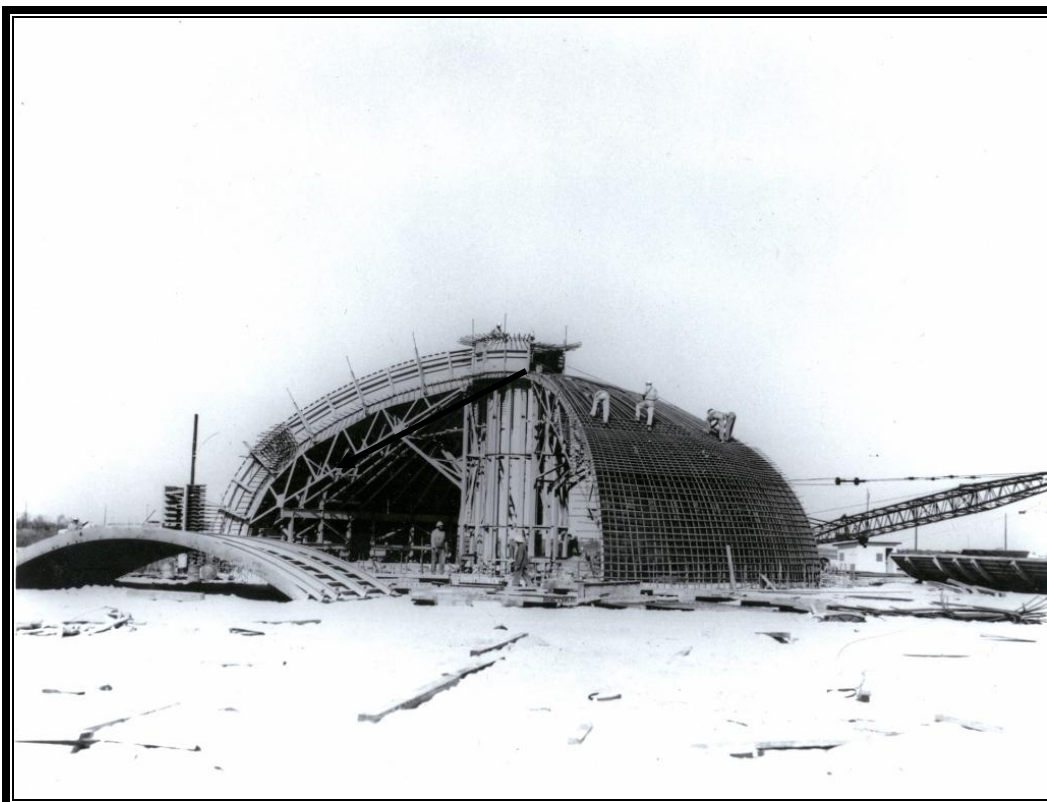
Photograph showing Facility 18800-Blockhouse (8BR3155) under construction (USAF 1959).
